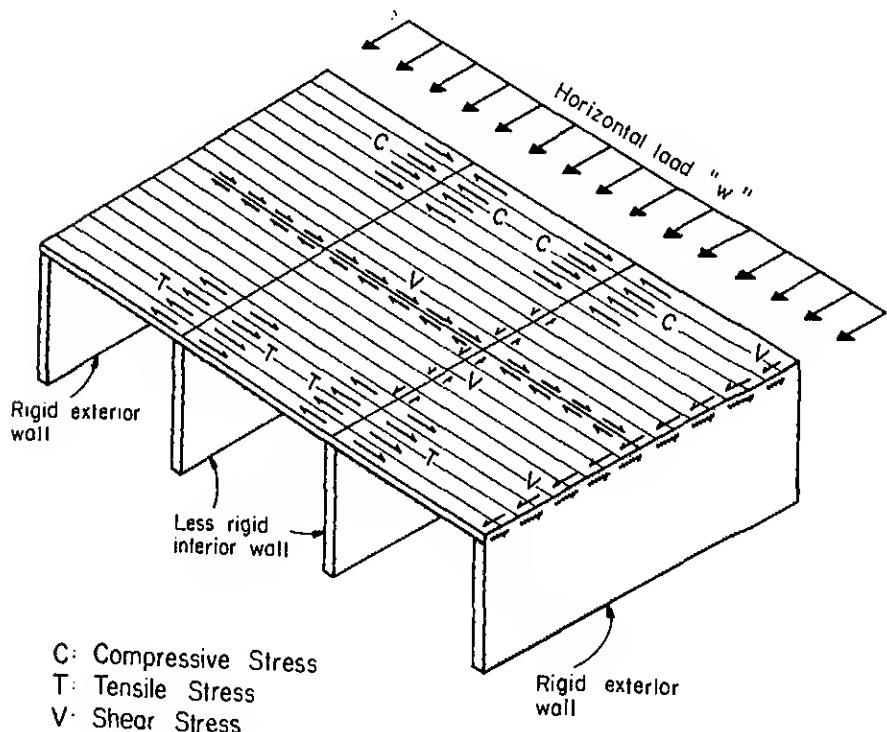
Stresses in Horizontal Connections induced by Diaphragm
